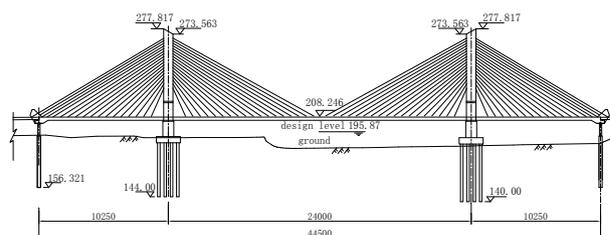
The Layout of Lanqi Songhua River Bridge [cm]
